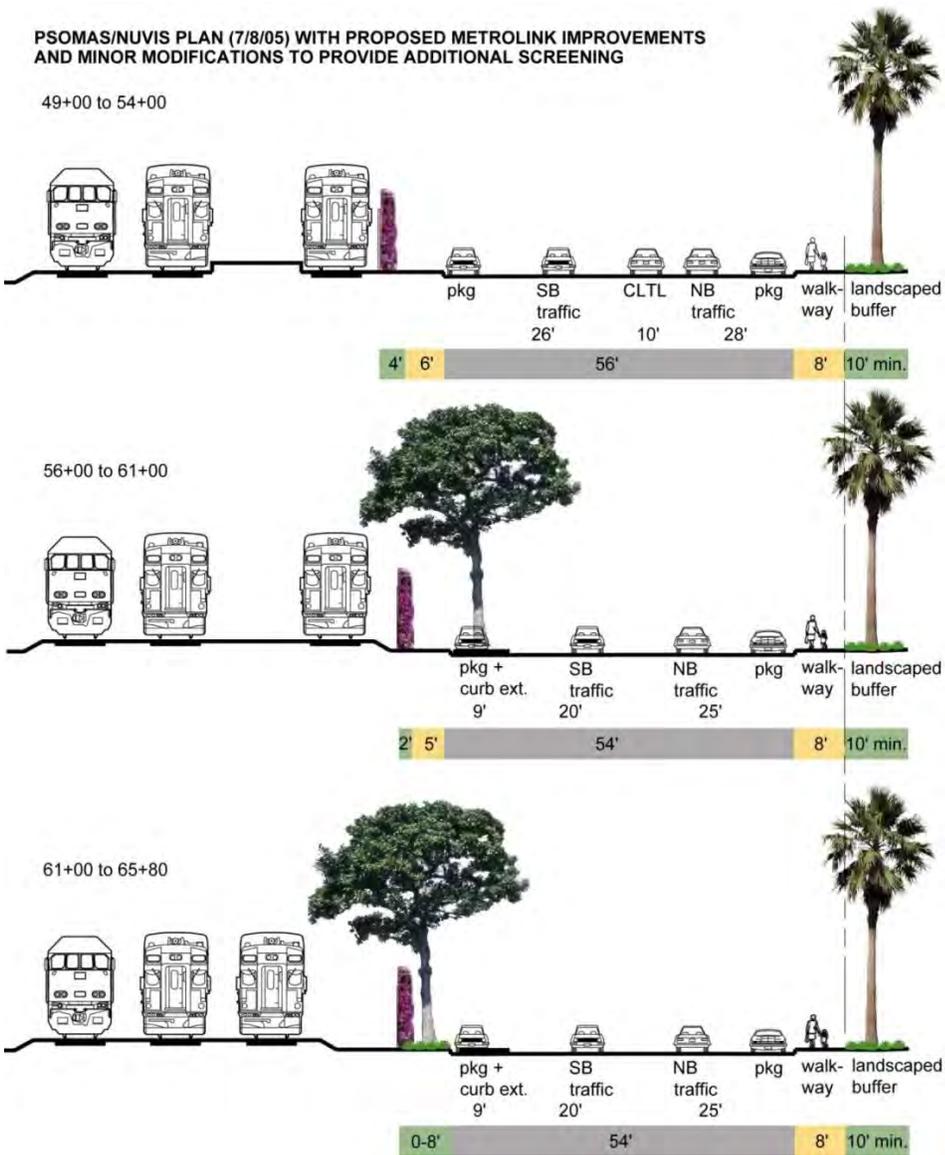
C Camino Capistrano: Cross Sections—Looking North
